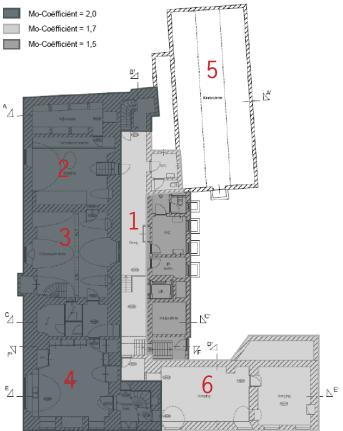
Floor plan cellar (Source: NIBE, 2008)
